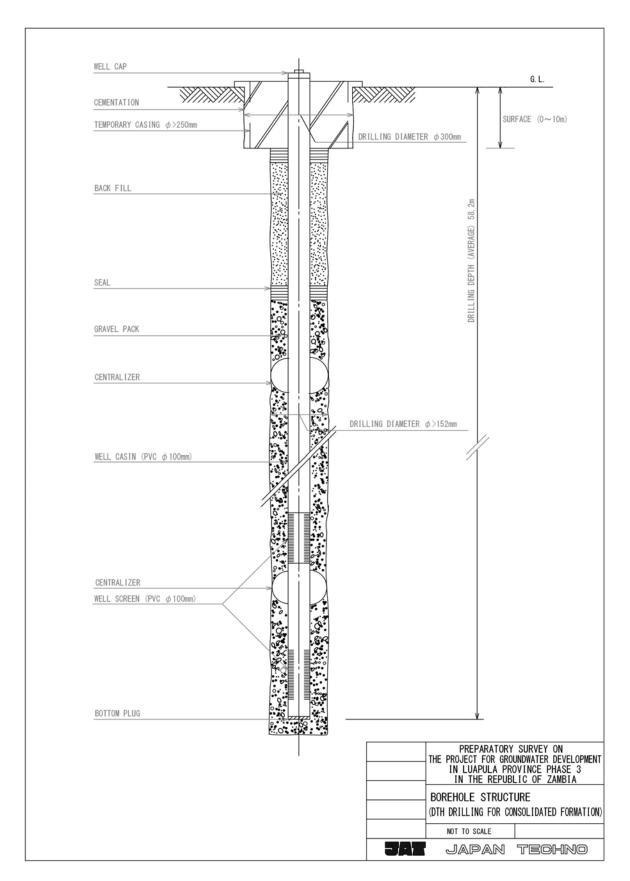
Standard Drawing for Borehole Structure (DTH Drilling)
